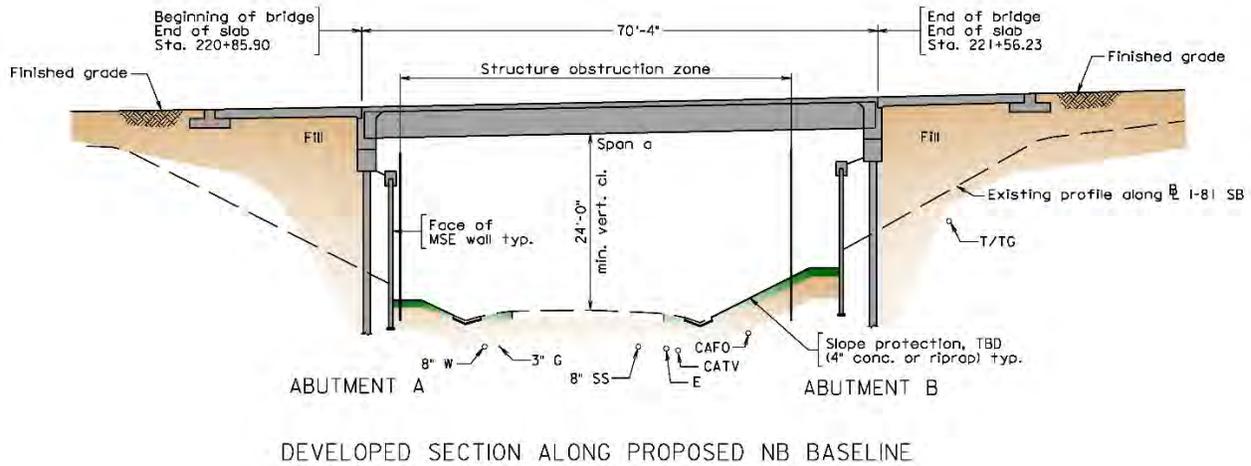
Elevation Section - I-81 Over Route 619 (Wildwood Road)
